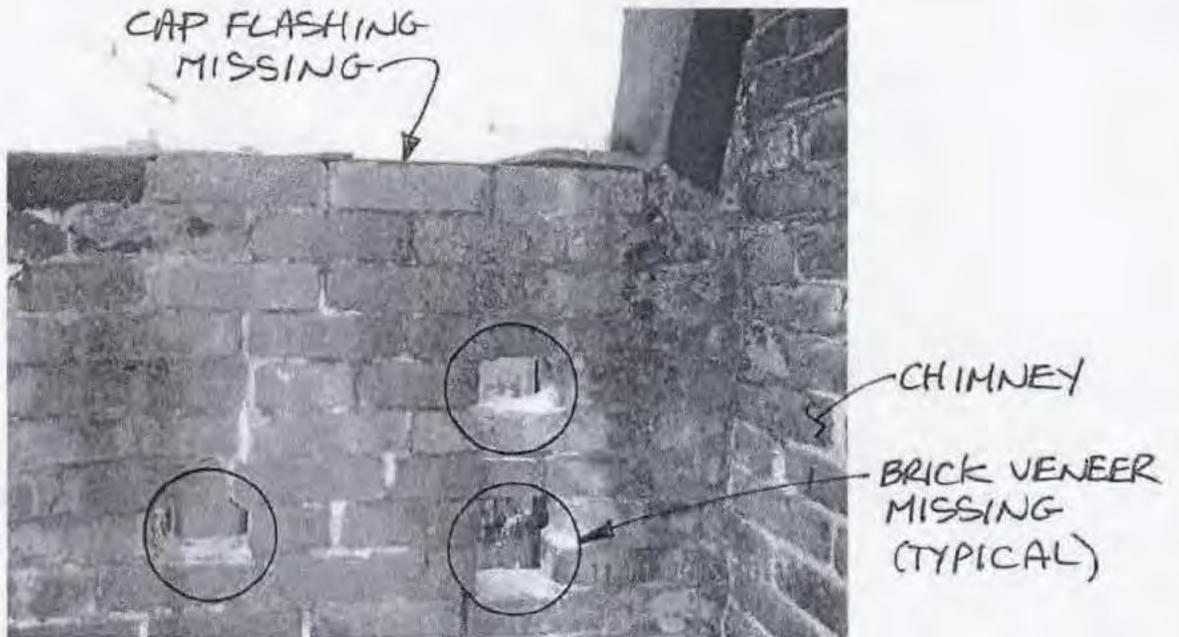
Pieces of Brick Veneer Missing on West Elevation of 439 Powell Street, Vancouver
